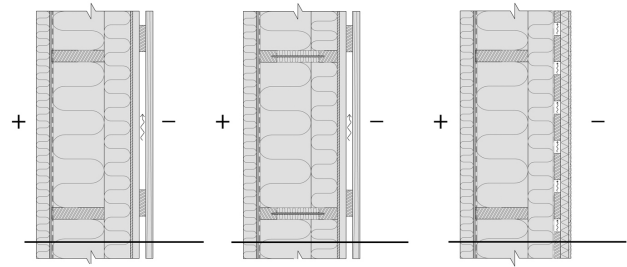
Examples of TES system based stick-frame elements to be fastened to the inner shell of a building's concrete exterior wall elements. The facade can be made of plaster or ventilated cladding, for example [26]
